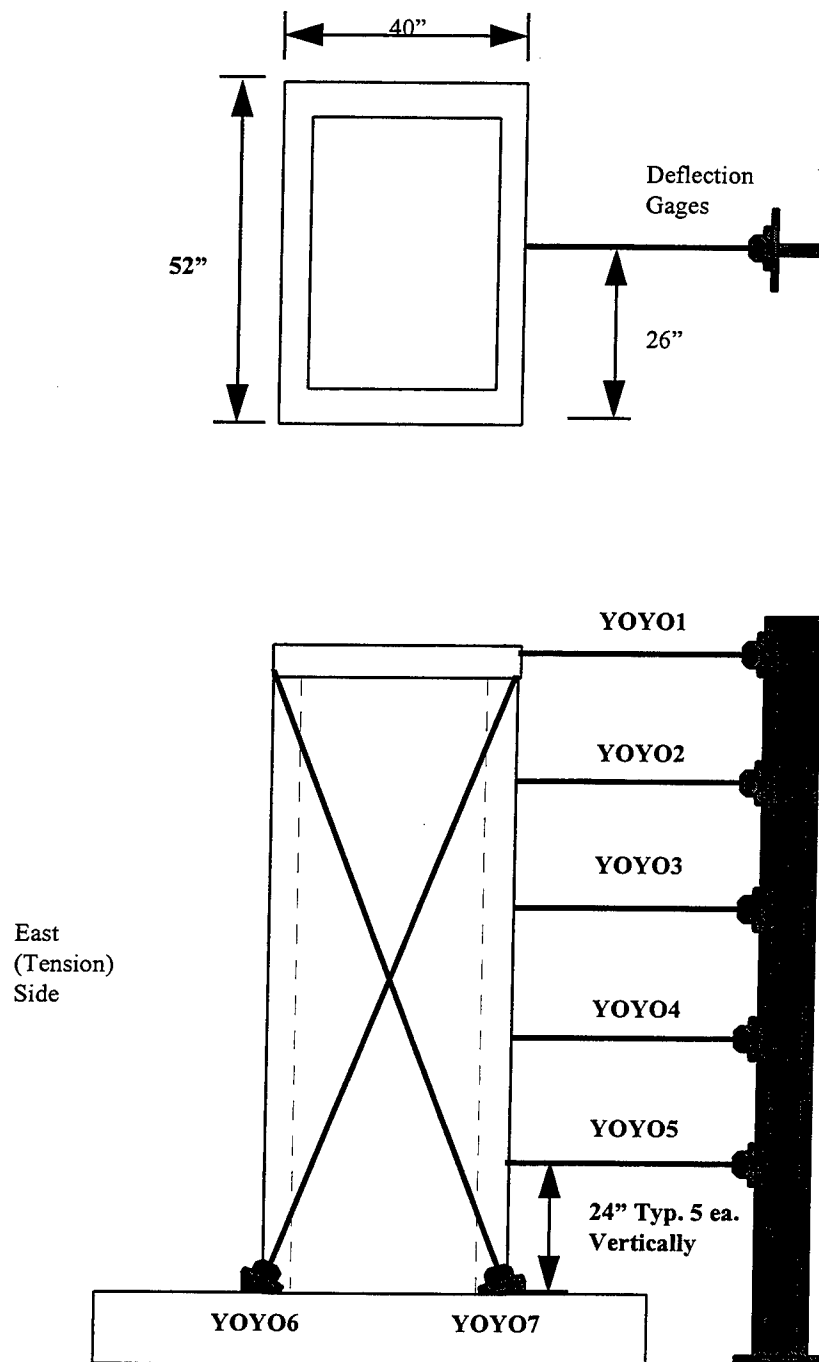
Plan view and elevation view of deflection gage locations on ITS-1 structure.
